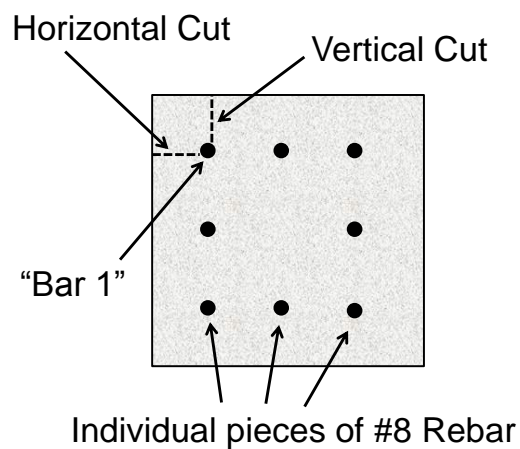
Cross-section of Pile #2 showing vertical and horizontal saw cuts. H-beam not shown.
